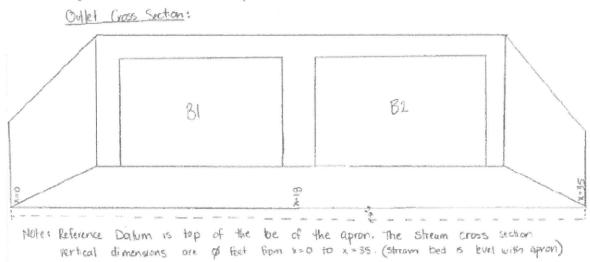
Example of a Stream Cross Sections at Culverts with Aprons
